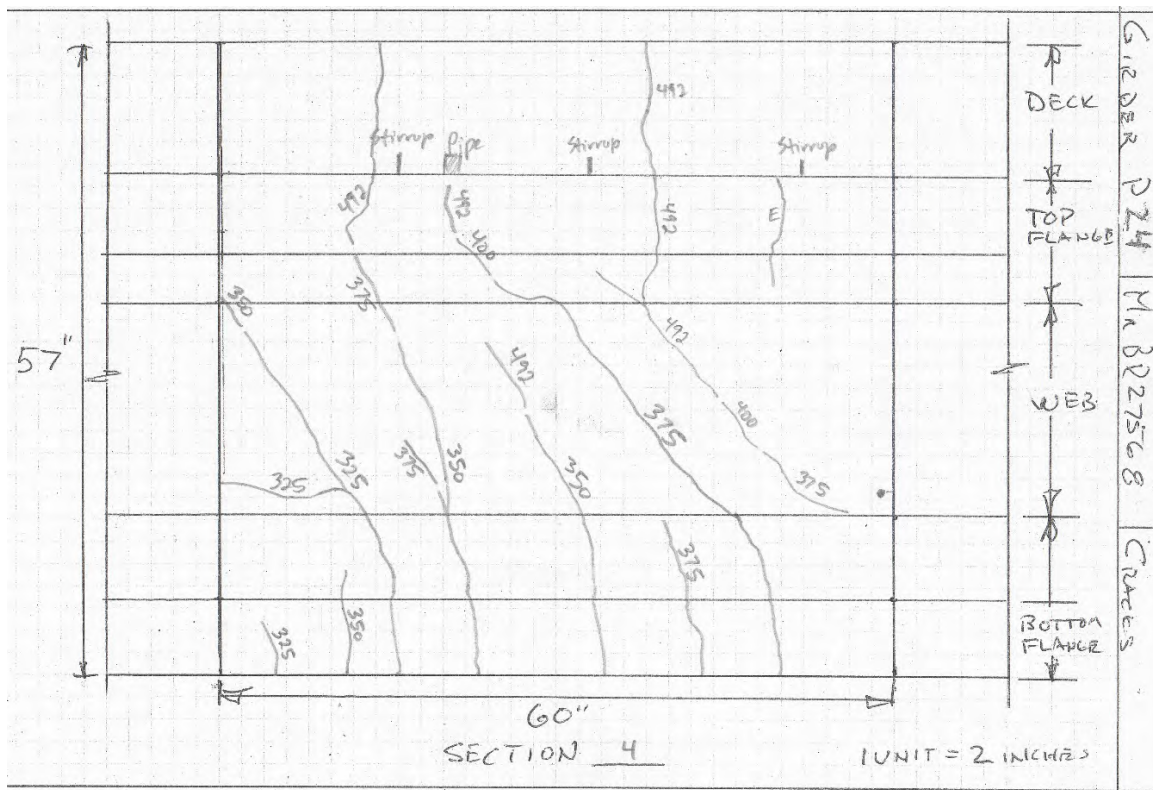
Girder P24 crack pattern – Section 4
